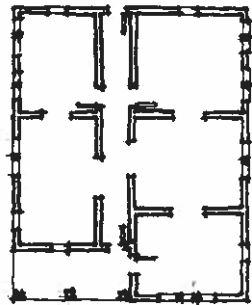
The One-Story Vernacular Queen Anne. Floor plan from the Tenth Street Historic District.
